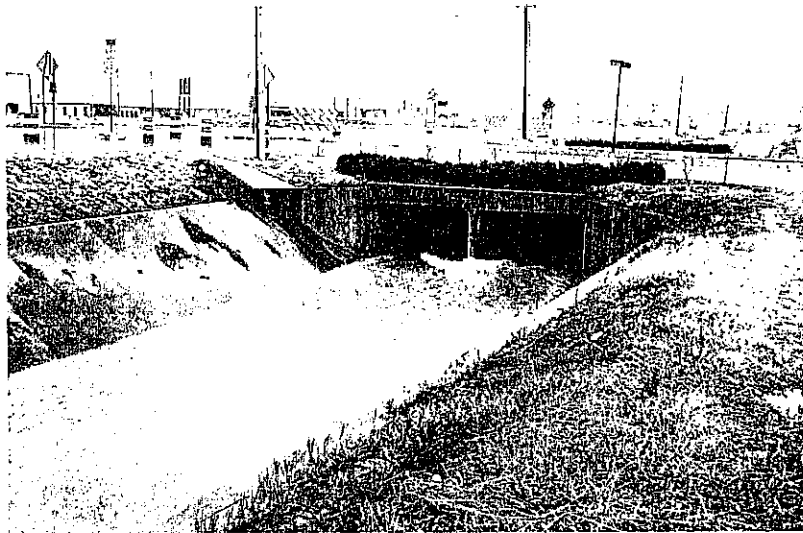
Properly constructed cast-in-place concrete double box culvert at Eastdale Mall.
